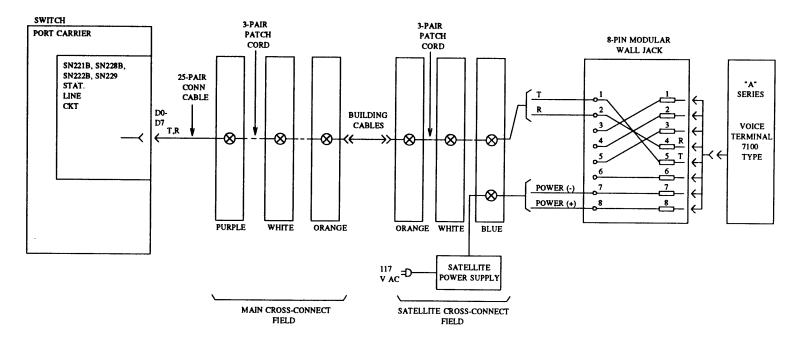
Typical A Series Voice Terminal Connections to Switch
